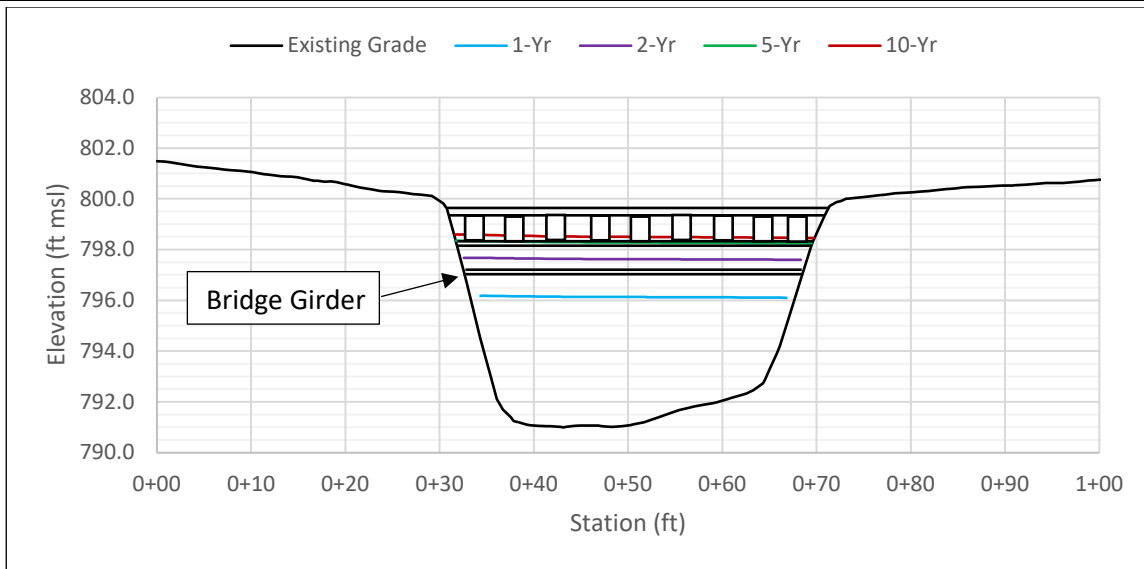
AWWU Bridge No.2 Profile; 1-Yr to 10-Yr Flood.
